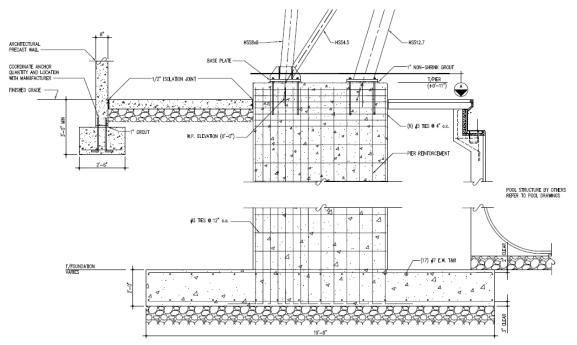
Detail of Pier Supported Large Tapered Truss Column
